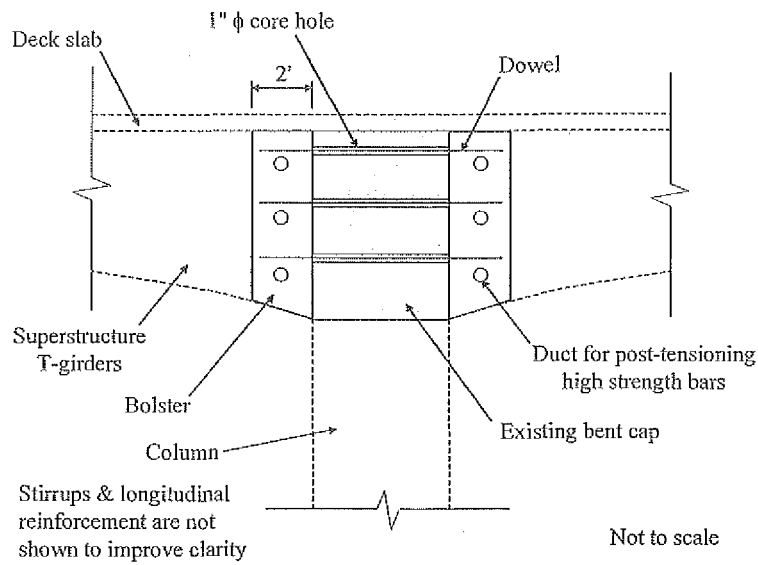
Retrofitting of Bent Caps by Concrete Bolsters
